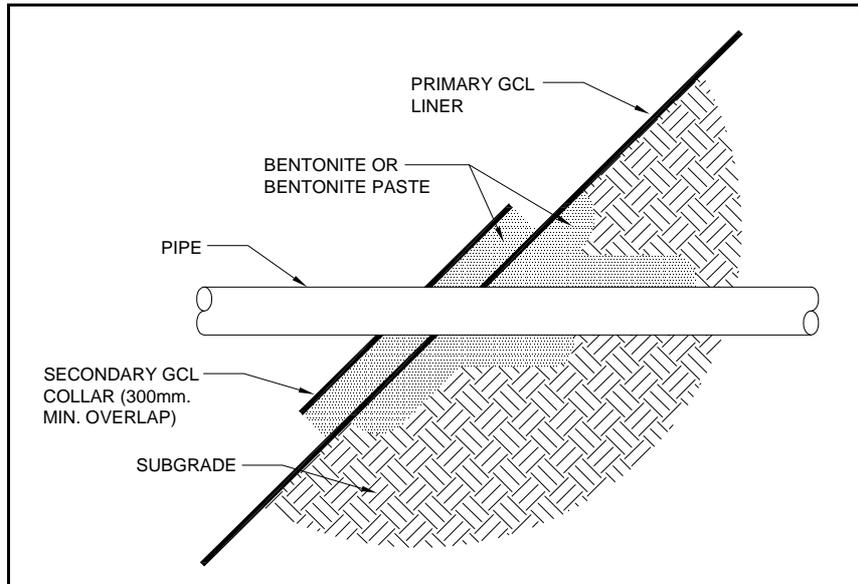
Typical pipe penetration section detail (after ASTM D 6102) (Note: change min overlap to 500mm)
